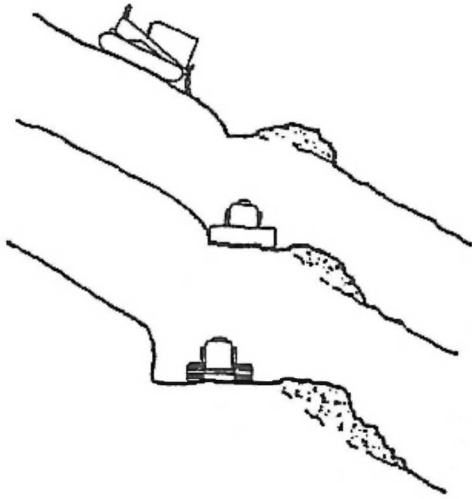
Creating initial access/benches (Nichols, 1956).
